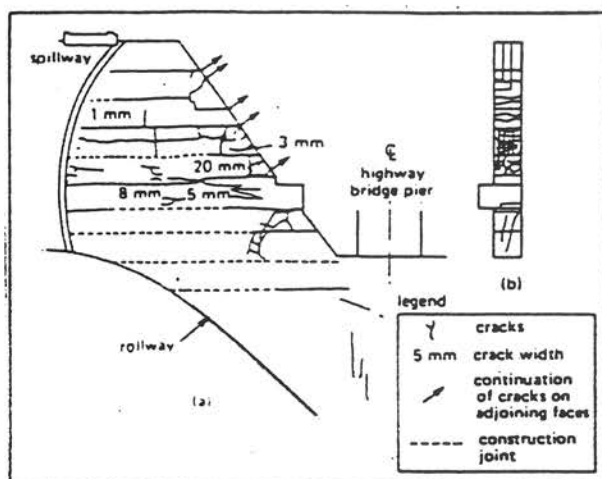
Cracking on a pier of Kumburu spillway: (a) side; and (b) end²⁵.
